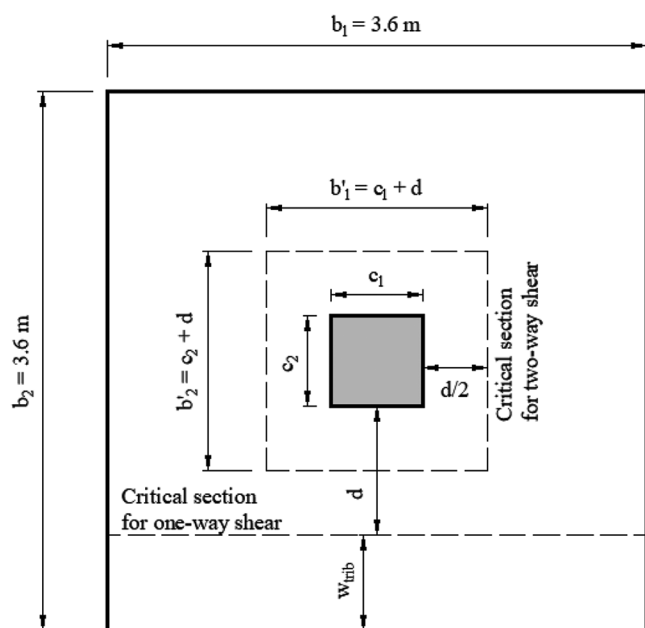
Square footing, column dimensions, and critical sections for one-way and two-way shear.
